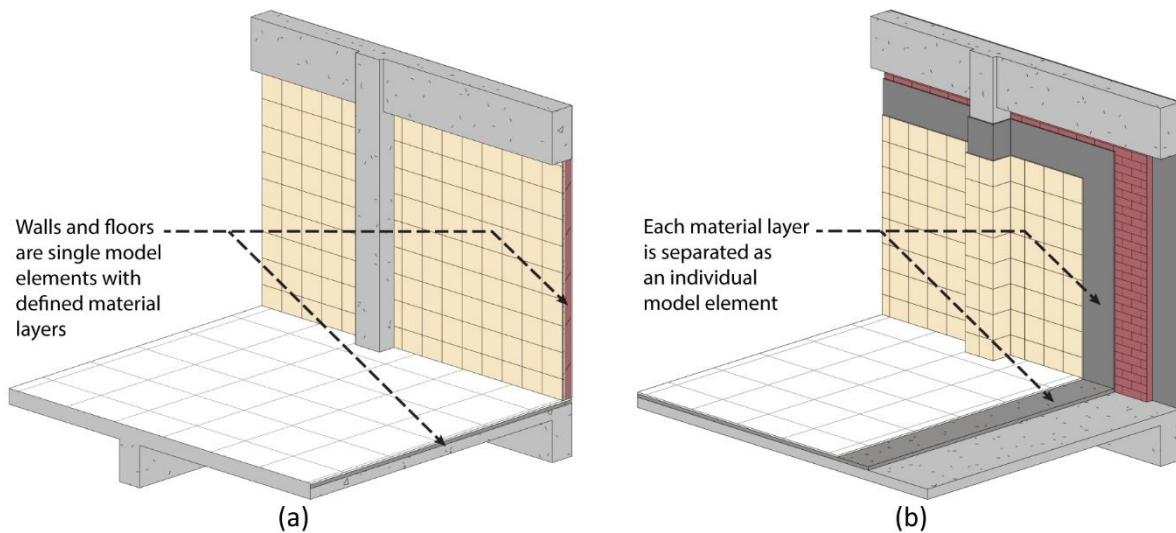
(a) A masonry wall and a floor at LOD 300. (b) A masonry wall and a floor at LOD 350.
